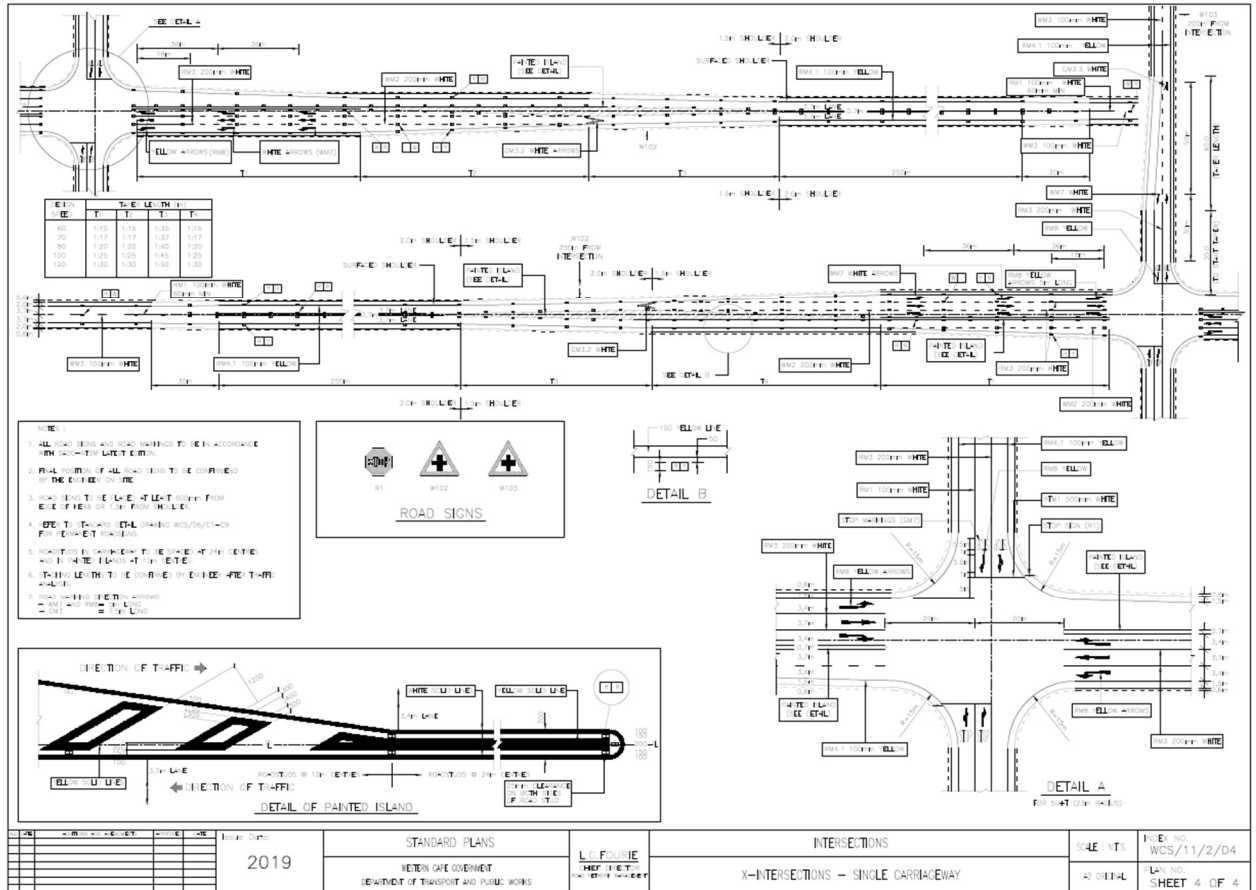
WCG Standard Plan for 4-Legged Intersection
